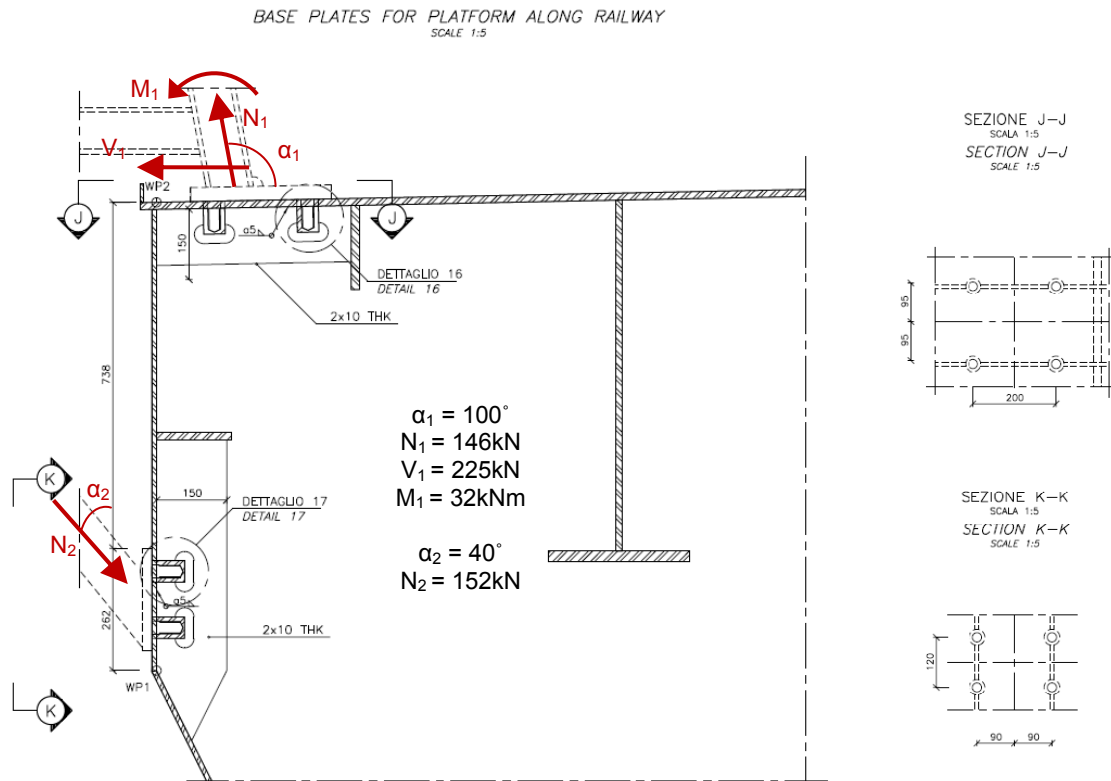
Applied load and geometry of back-up steel for walkway along railway
